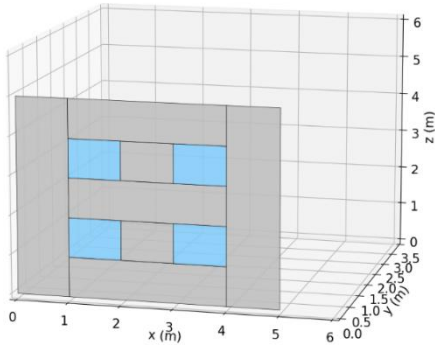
Small house facade to be compared with the ENAC campus building. Grey: dominant material, blue: glass.
